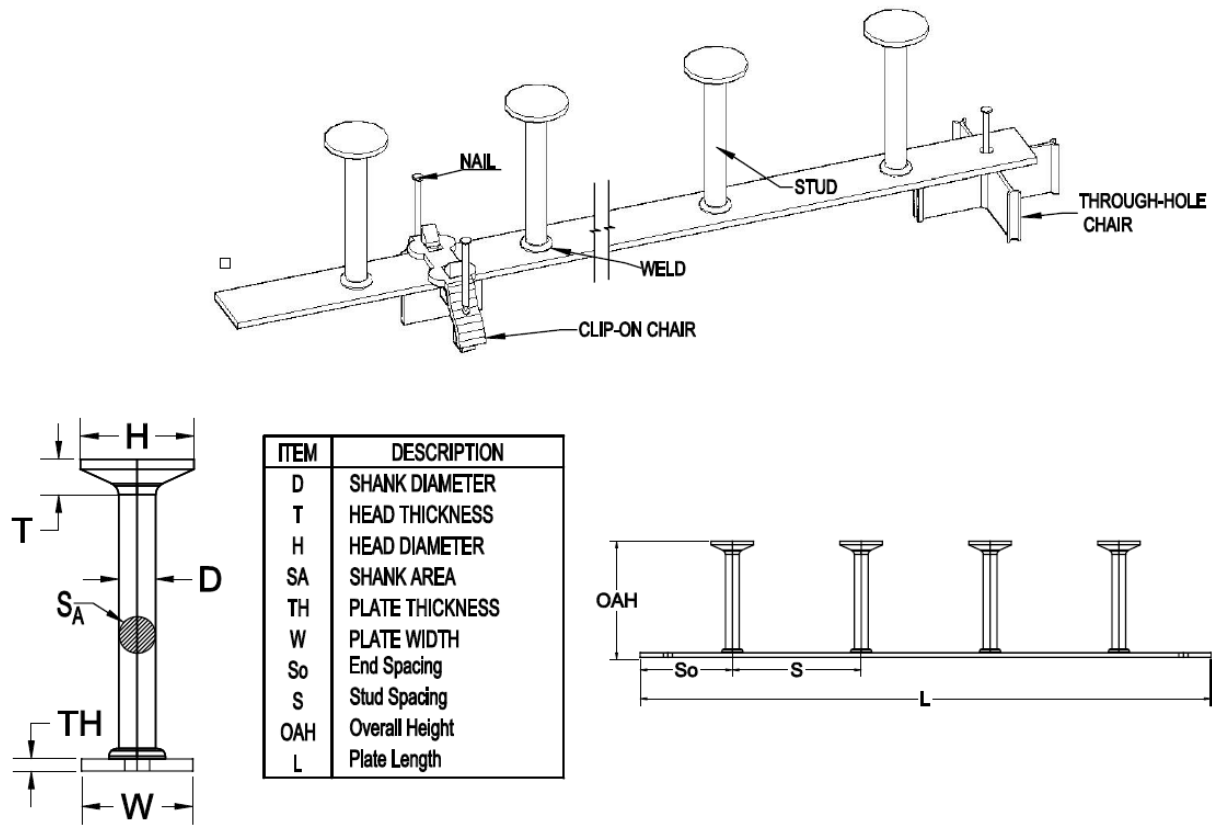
TYPICAL JSW STUD RAILS REINFORCEMENT SYSTEM ASSEMBLY
